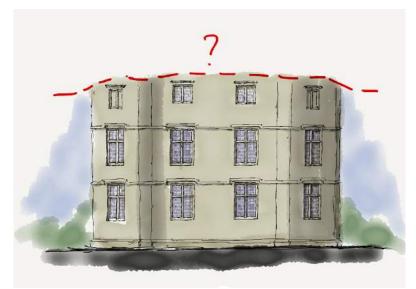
Reconstruction, as far as is possible, of the original south elevation.
